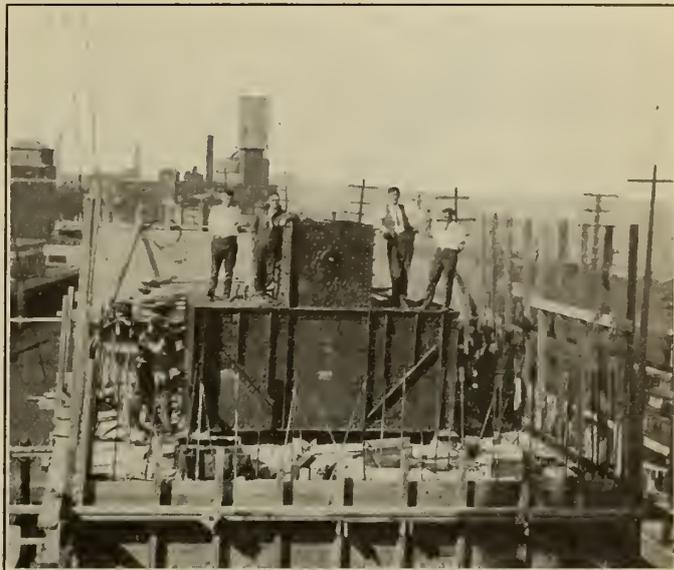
Main Span, North Side—Setting of Anchorage Grillage at Anchor Pier.
